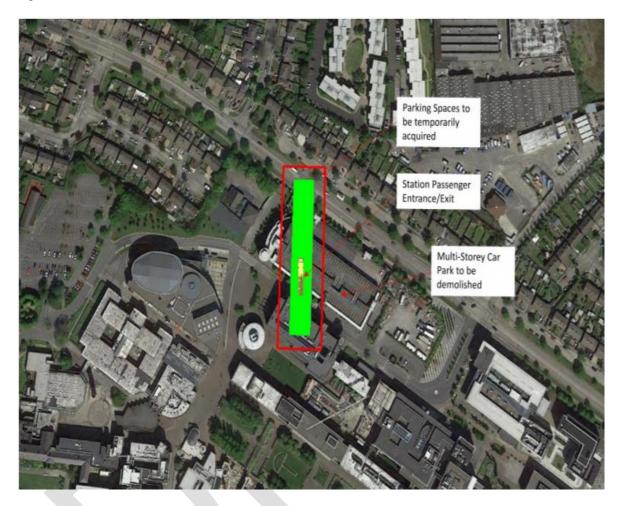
Metro North - DCU Ballymun Road (South Option) Location
